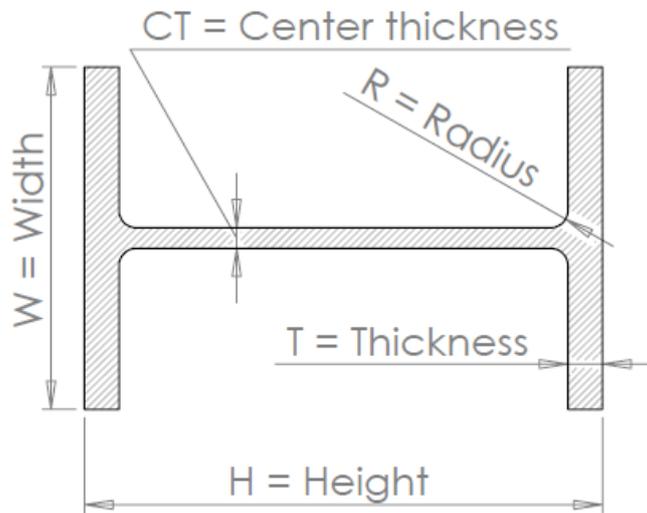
H Beam - HEA, HEB, HEM and IPE beams (parallel flanges)
